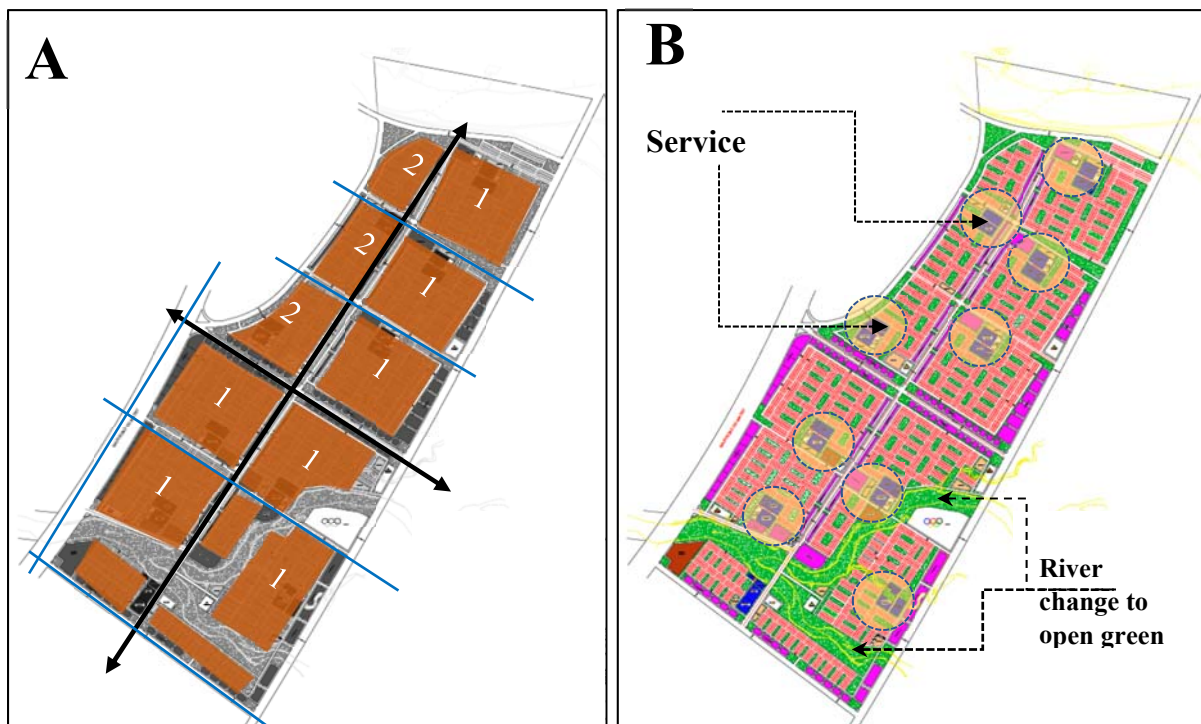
Grad Sor site plan – the residential block is one, repeated shape throughout the site
